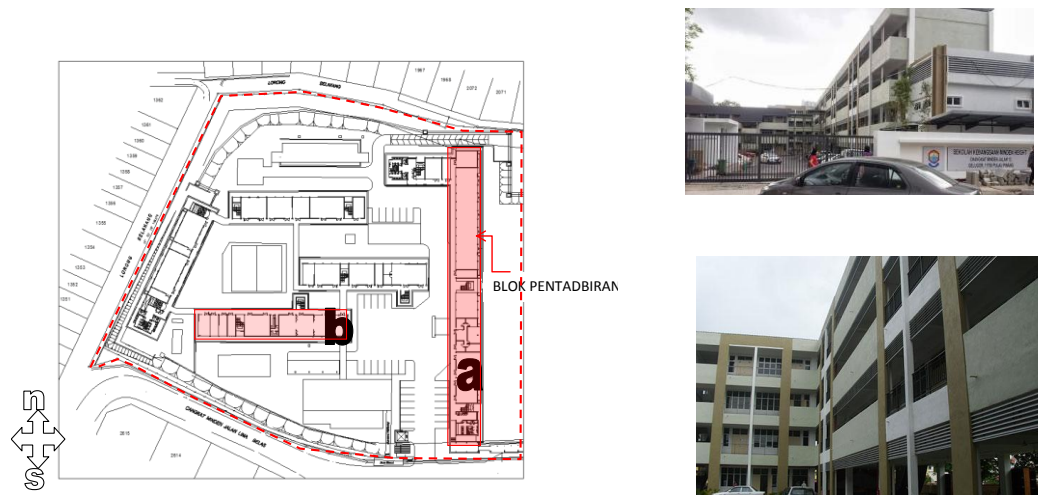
Plan and Photos of Sekolah Kebangsaan Minden Height
